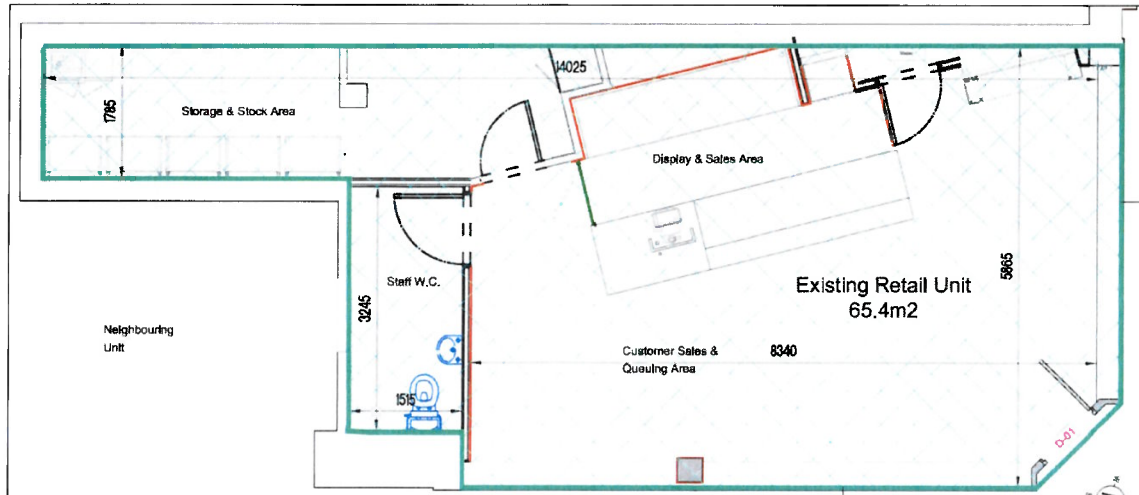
Ground floor plan of the Krispy Kreme retail unit.
